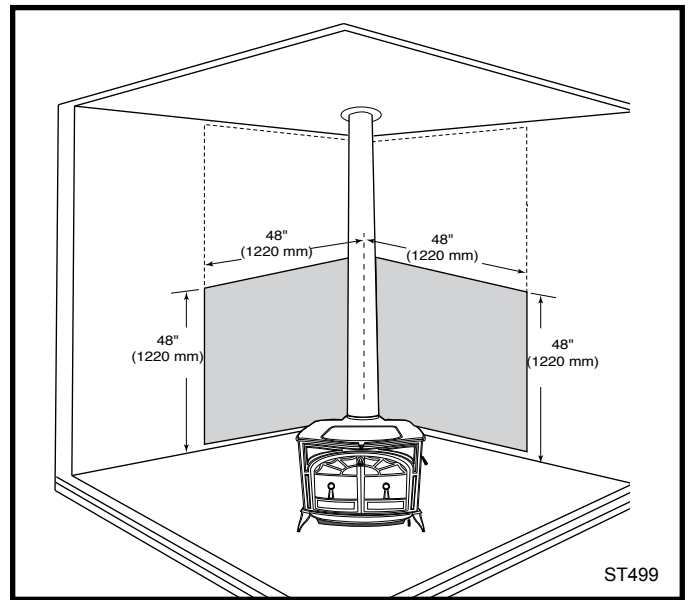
Corner installation, vertical chimney connector, two wall shields. Reduced side clearances. Wall shield MUST meet at corner.
